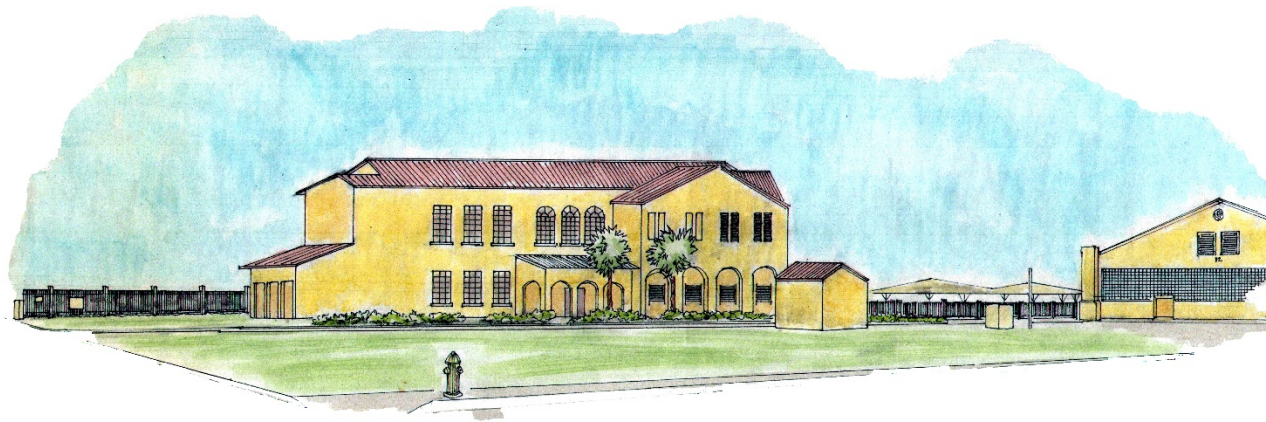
Stage house looking east along 5th Street East-desired future condition.
